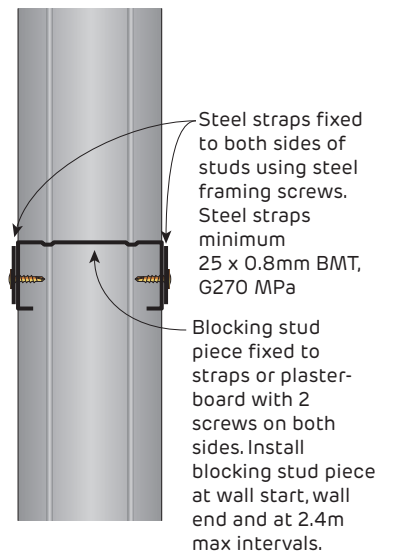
Steel Stud Frame with Strap and Block Nogging
